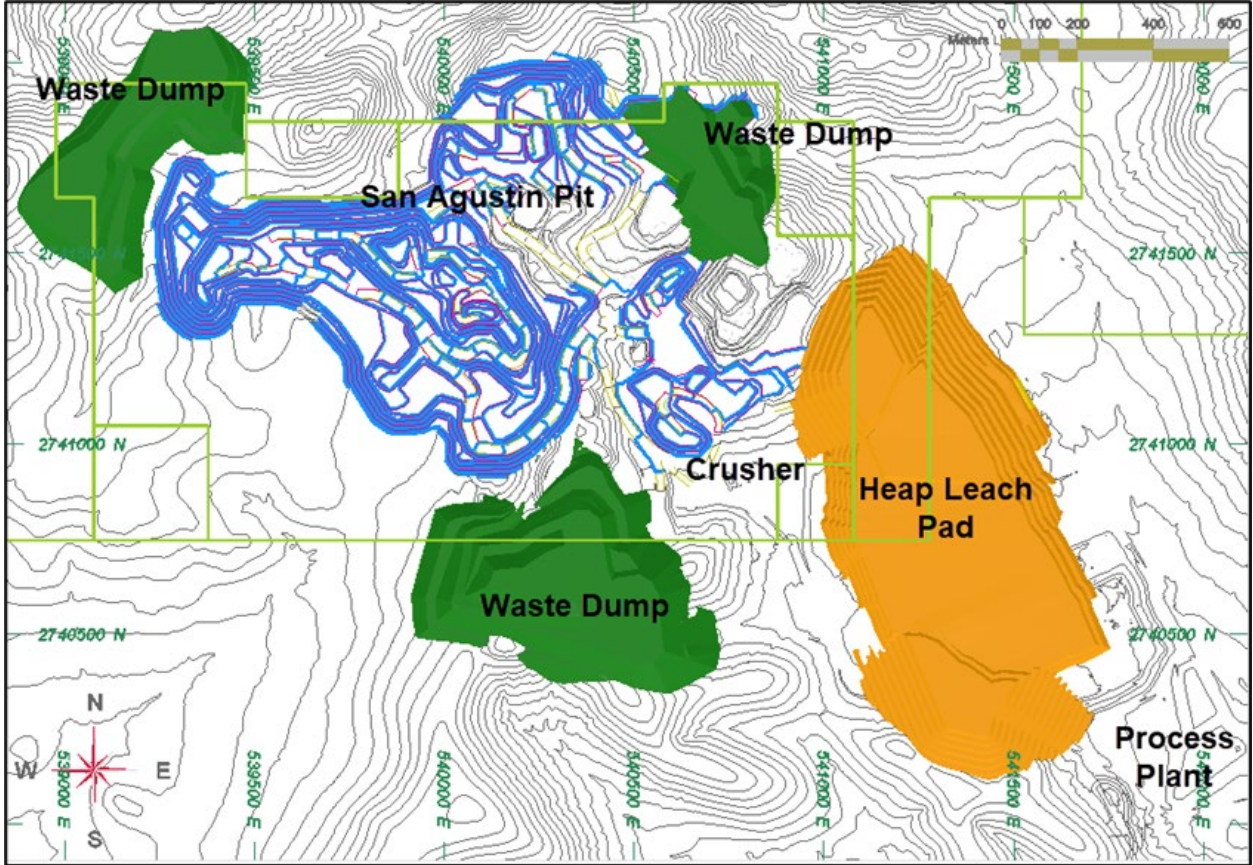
illustrates the San Agustin site layout at the end of the current LOM plan.
